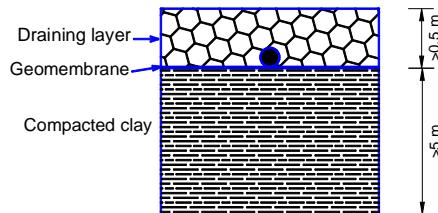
Detail "A" - Sealing/drainage structure of bottom and slopes
